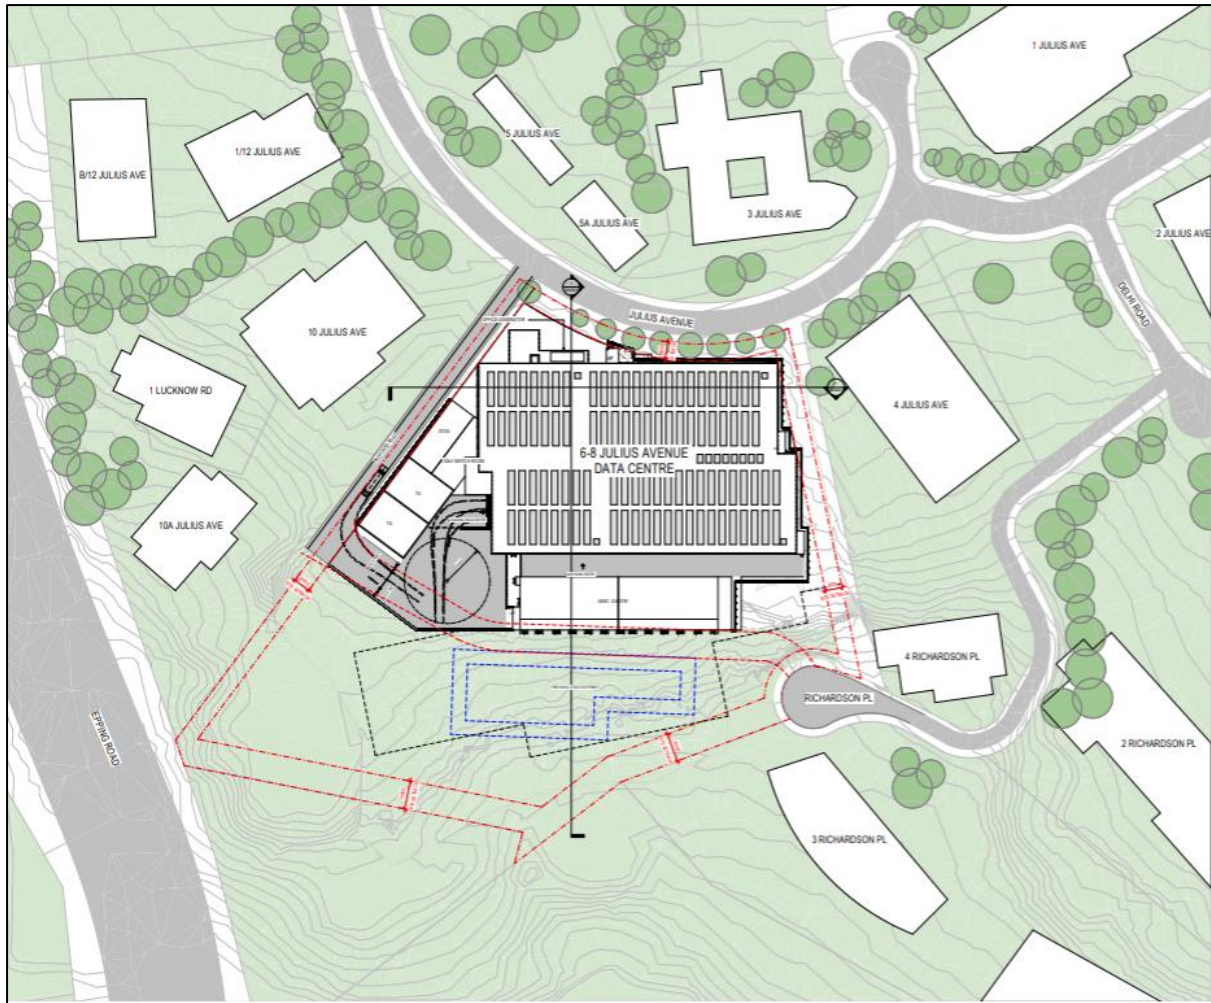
Amended Site Plan (Source: Greenbox Architects, 2025)
